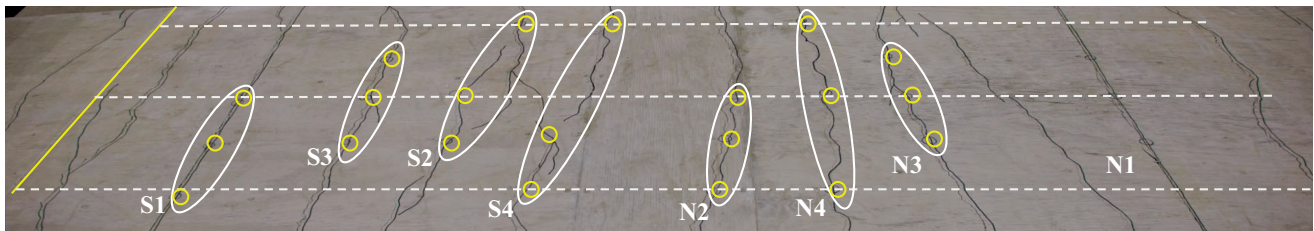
Crack pattern and measurement locations (ZC1-12).
